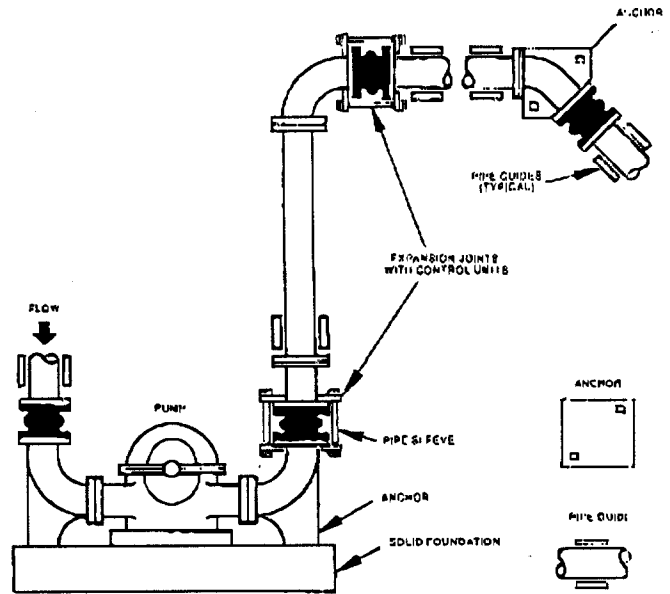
C: Typical Piping Layout Showing The Use Of Control Units With The Expansion Joints When Proper System Anchoring Is Limited
